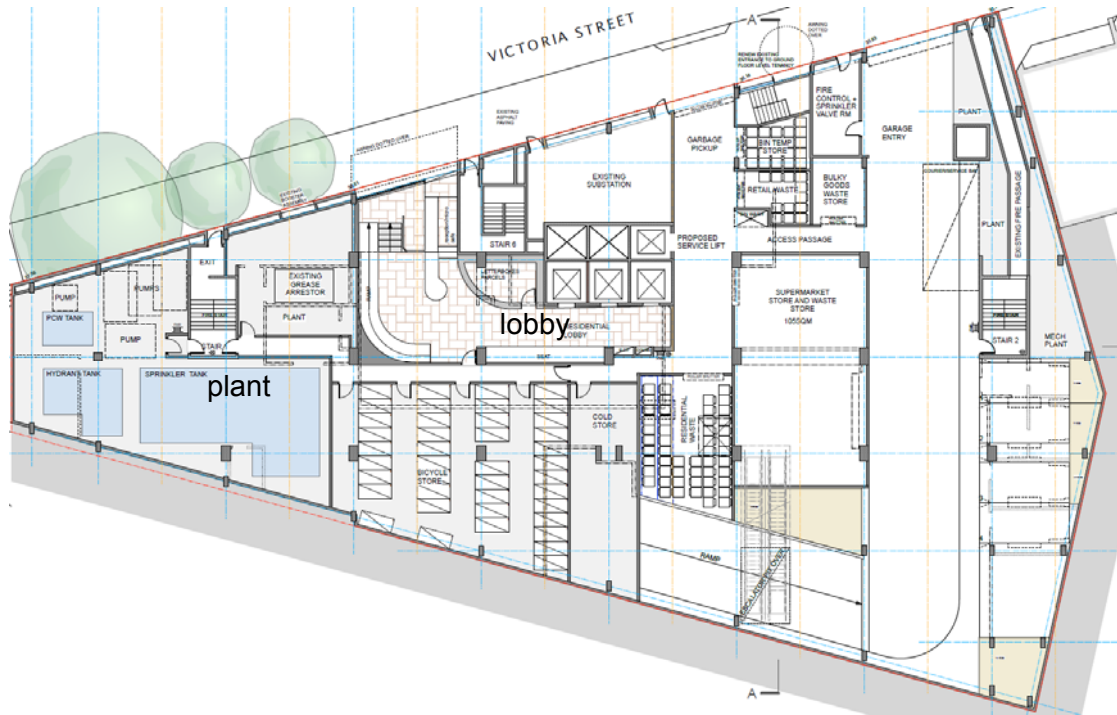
Podium basement Level 1, including the residential lobby accessed from Victoria Street
